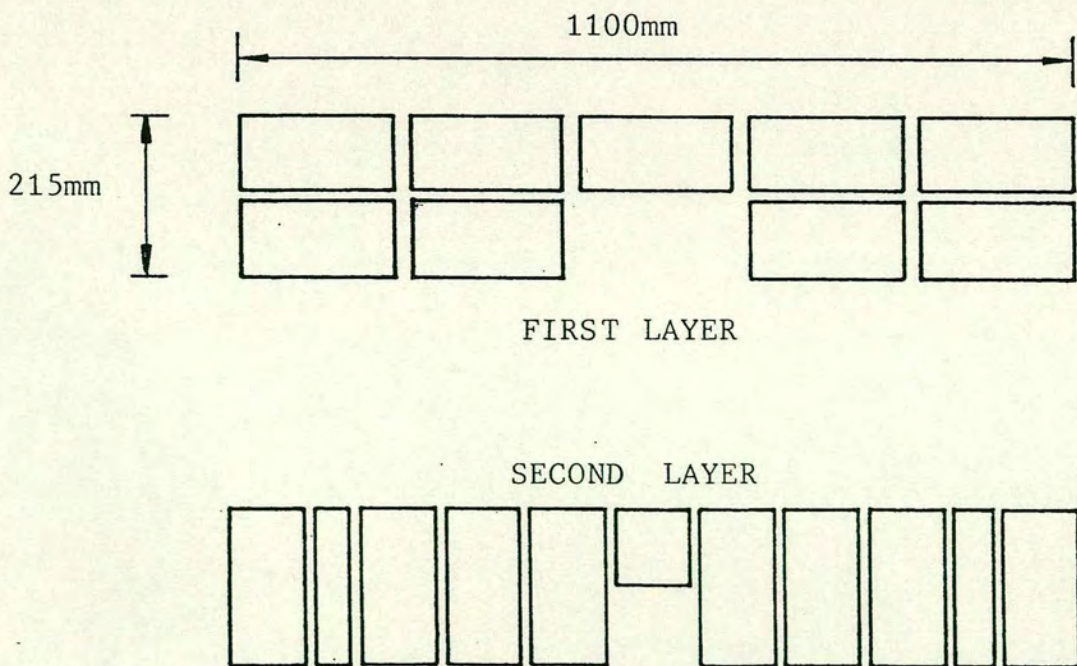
English bond beams cross-sections (B3-B4) (constructed in vertical position)
